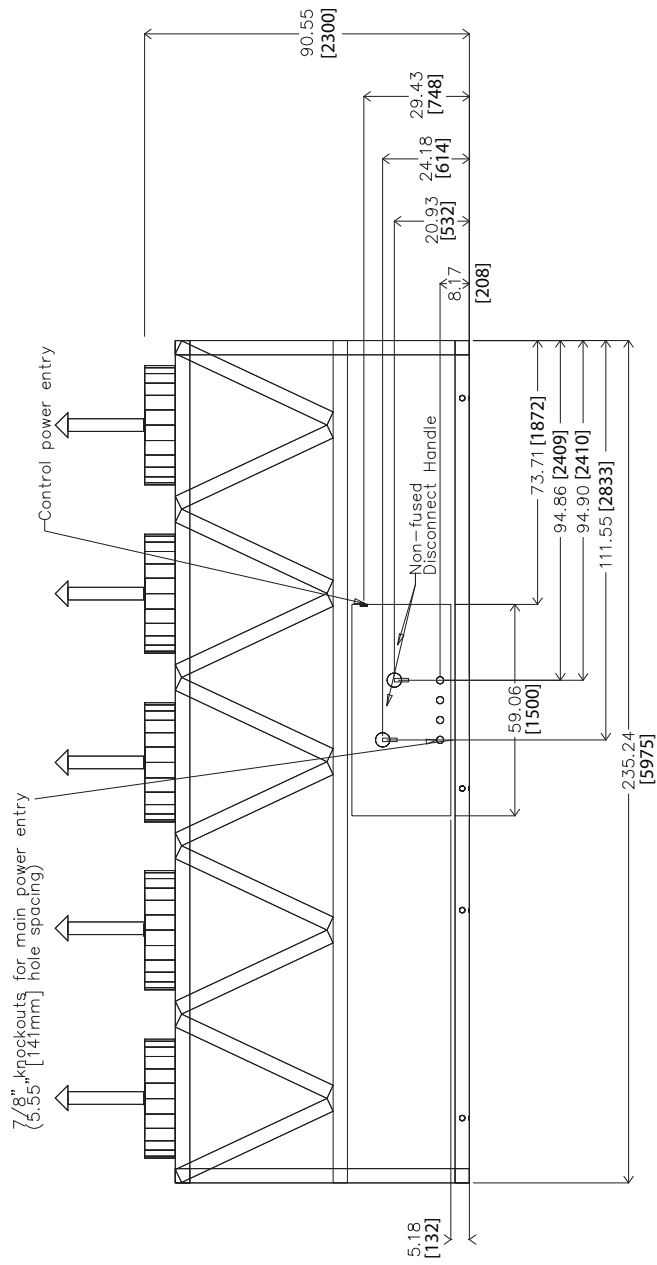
30XA140, 160 Air-Cooled Liquid Chiller without Pump Dimensions
